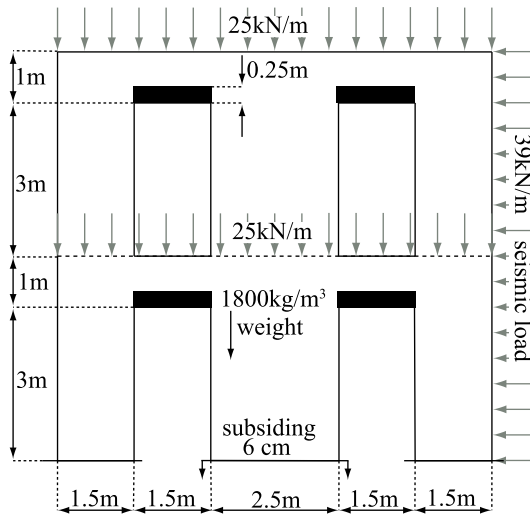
Masonry façade under working loads: geometry and load cases. Horizontal loads are considered in [Section 4D2](#) and [Figure 22](#), and foundation subsiding in [Section 4D3](#) and [Figure 24](#).
